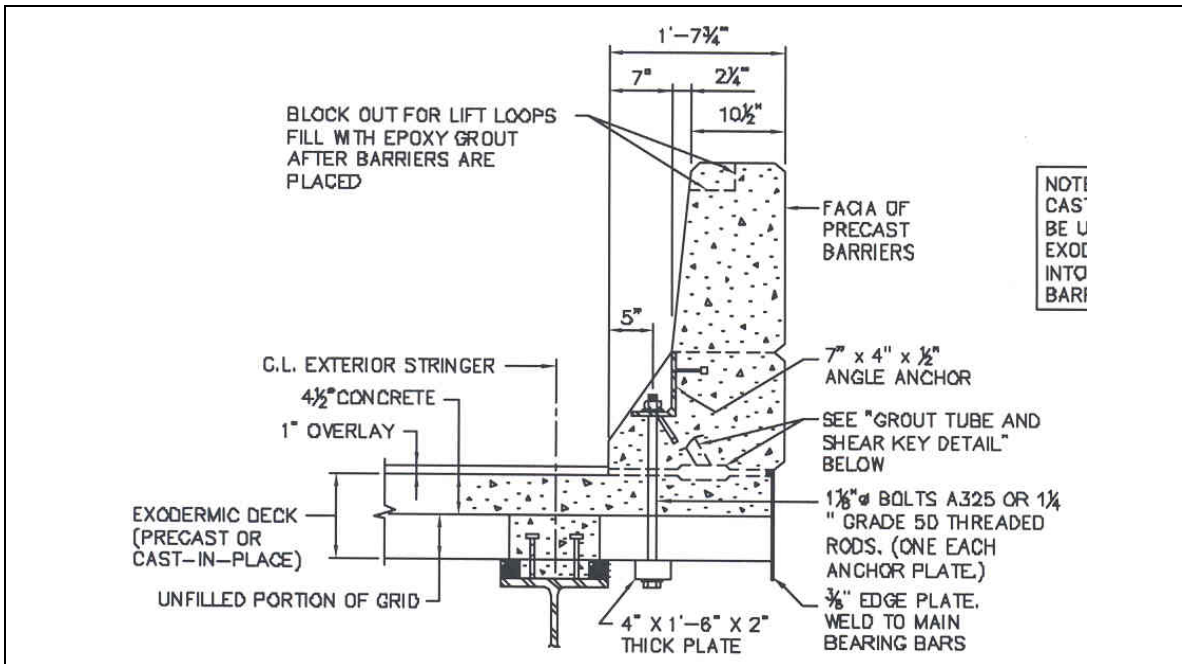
Typical precast barrier detail (Exodermic Bridge Deck, Inc., 2003)
